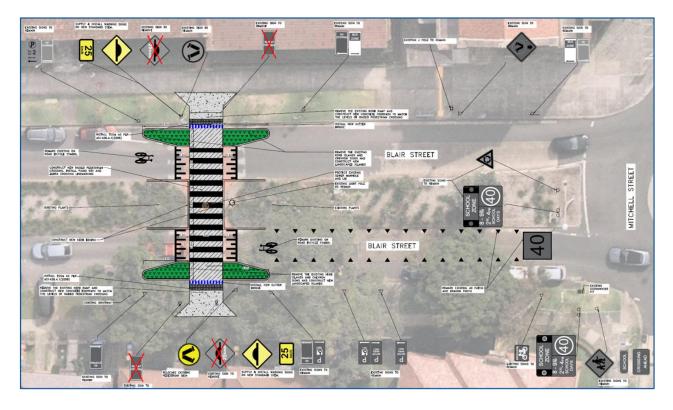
Proposed upgrade to raised pedestrian crossing on Blair Street, North Bondi, West of the intersection with Mitchell Street.
